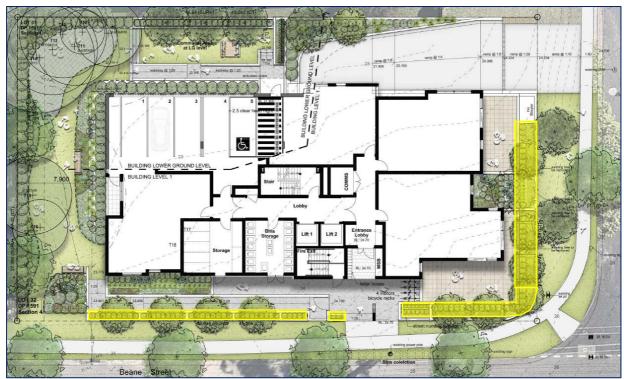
| Landscape Plan with front setback planter beds highlighted yellow (Source: Landscape Plan)
